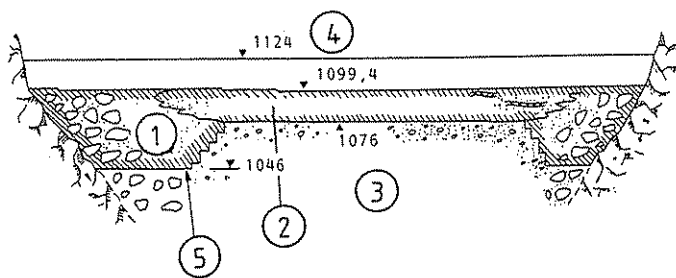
Eberlaste earth dam. Foundation conditions (adapted from Müller-Salzburg 1992).
